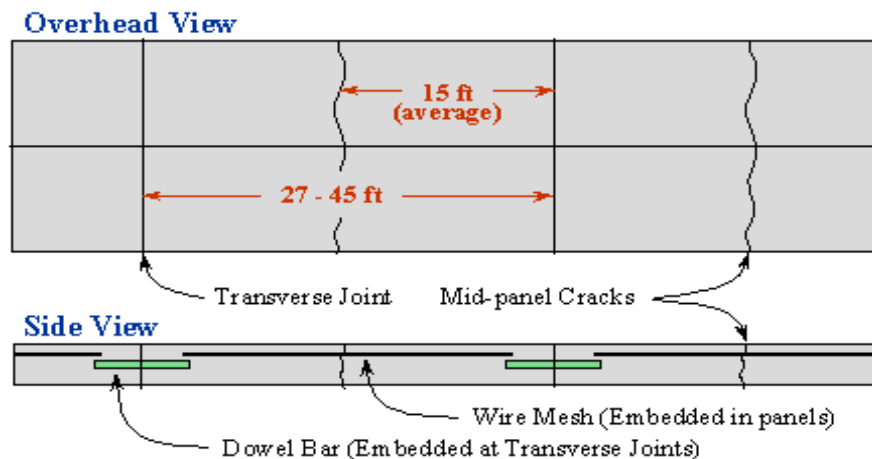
Jointed Reinforced Concrete Pavements (ACPA 2009)
